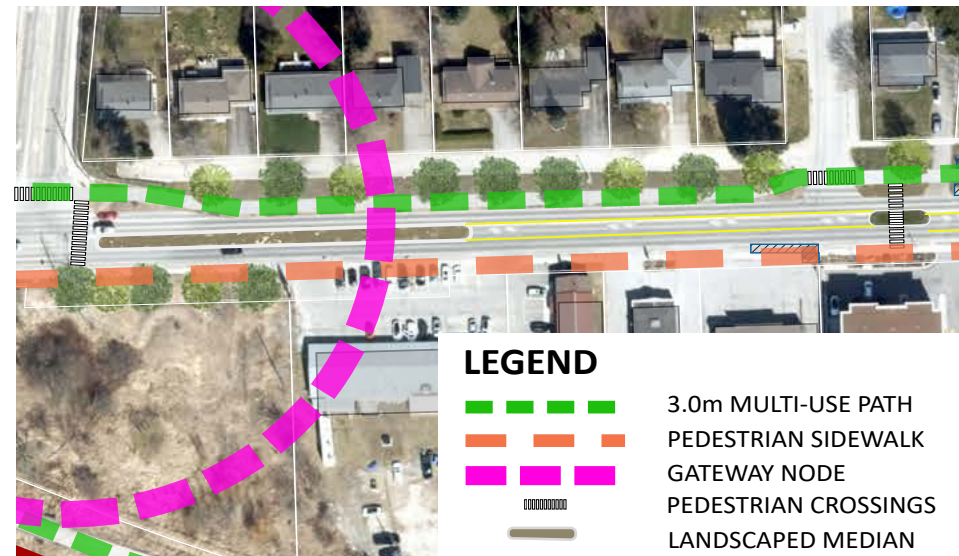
West Broadway Proposed Improvements in Plan View at Blind Line
